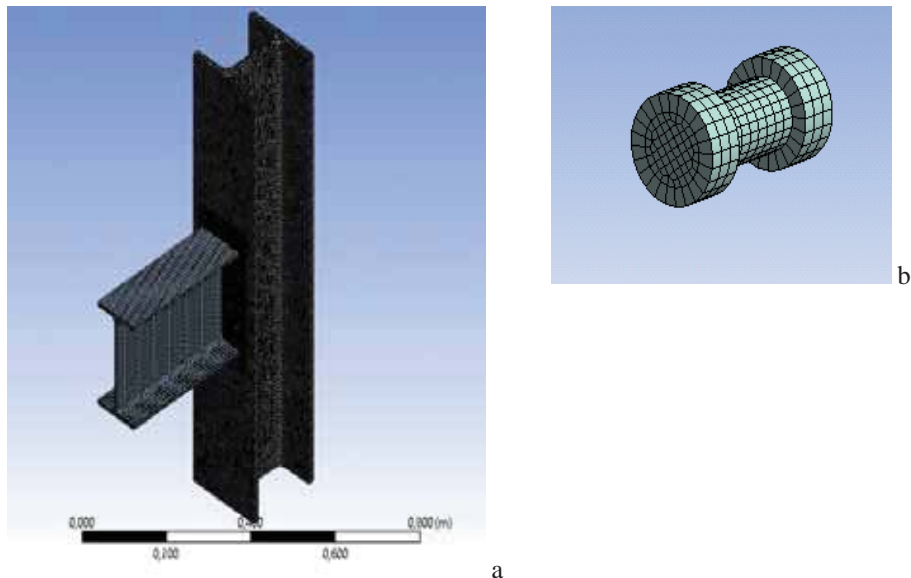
Finite element models: a) end plate-beam-to-column-connection, b) bolt.
